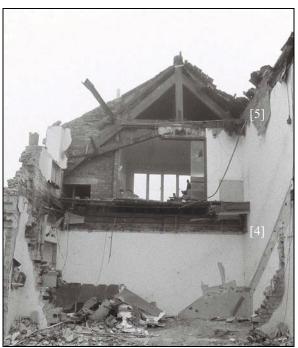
View of the in situ roof truss [5] and the northern transverse first floor beam [4]
